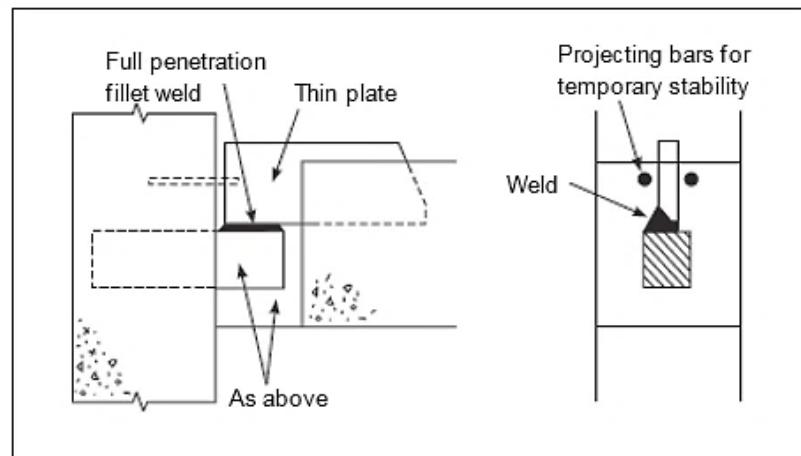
Beam to column connection using a welded plate (Elliott, 2002)
